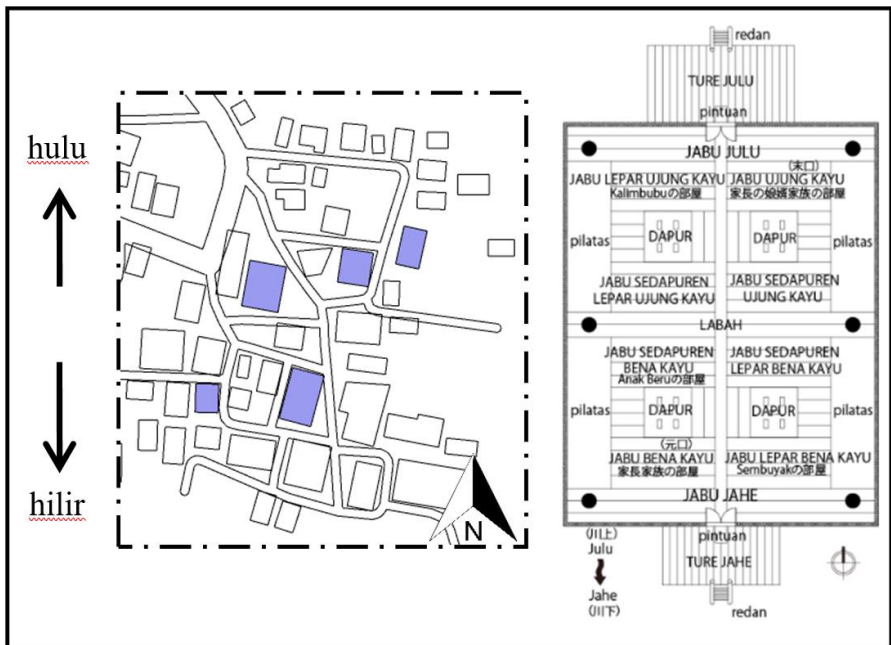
Lingga village plan (left), Karo house Siwaluh Jabu plan (right)
